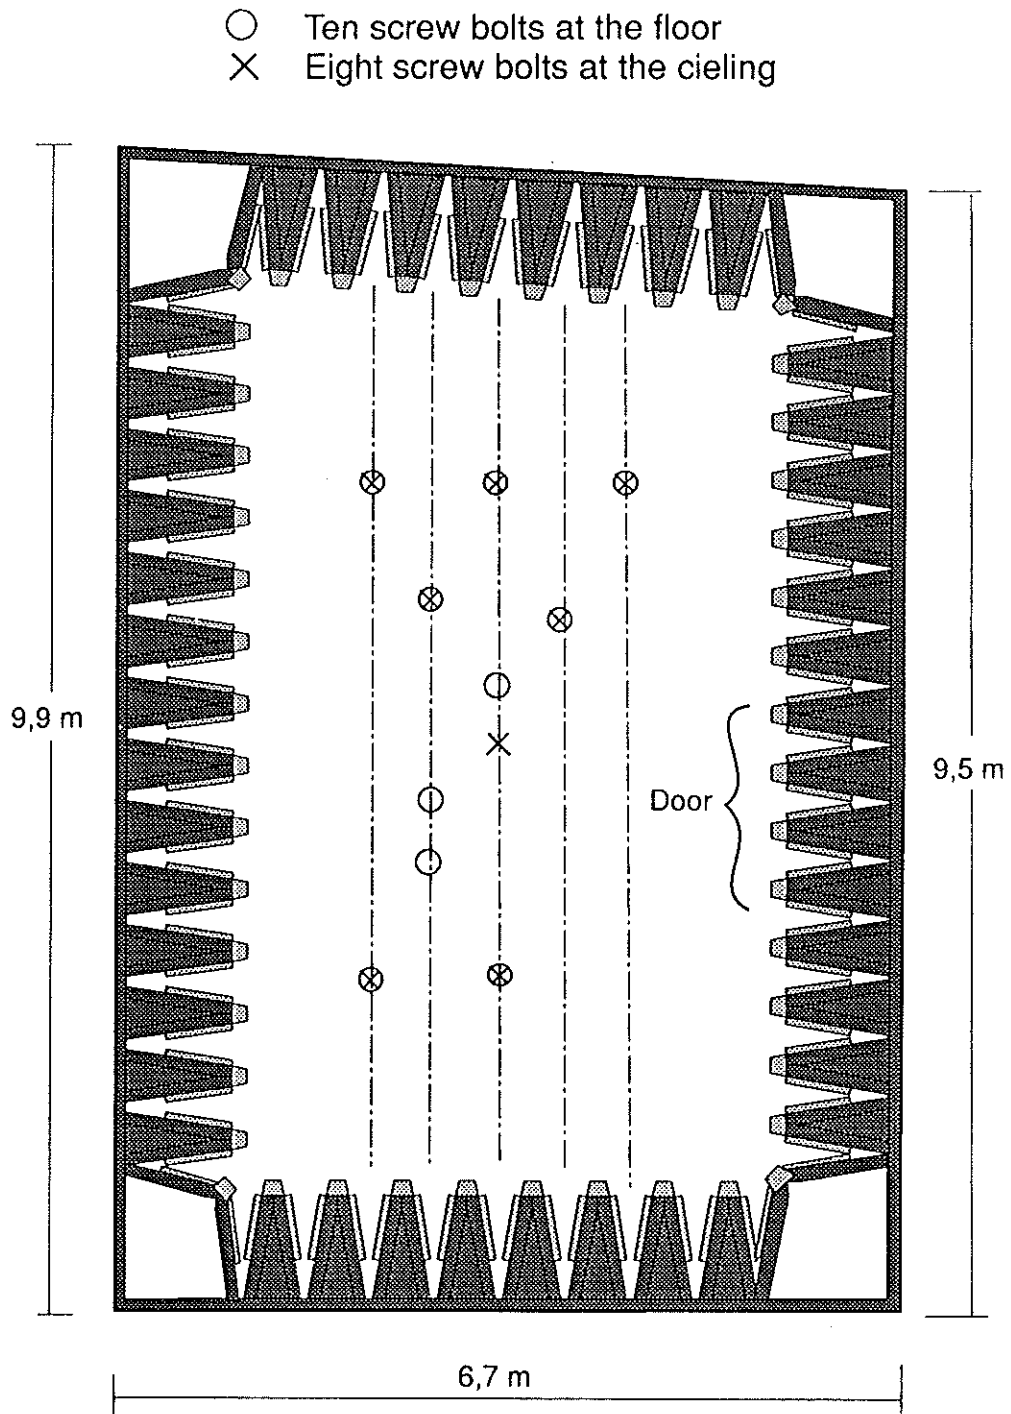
Position of the screw bolts fastened in the floor and the ceiling concrete.
